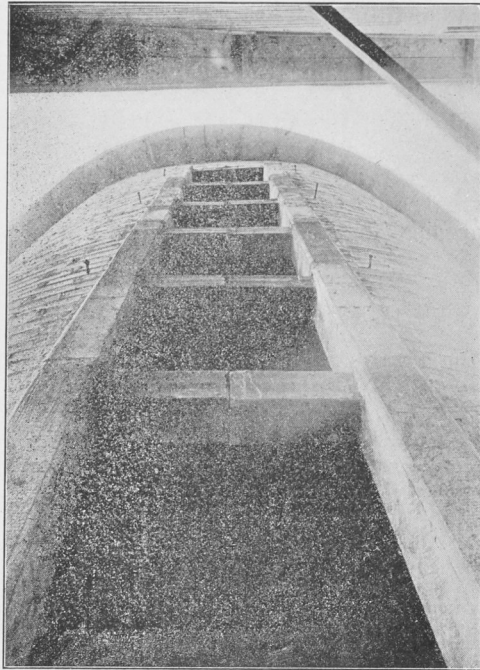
View of Doorway, looking toward the roof. Notice the size of Openings.
